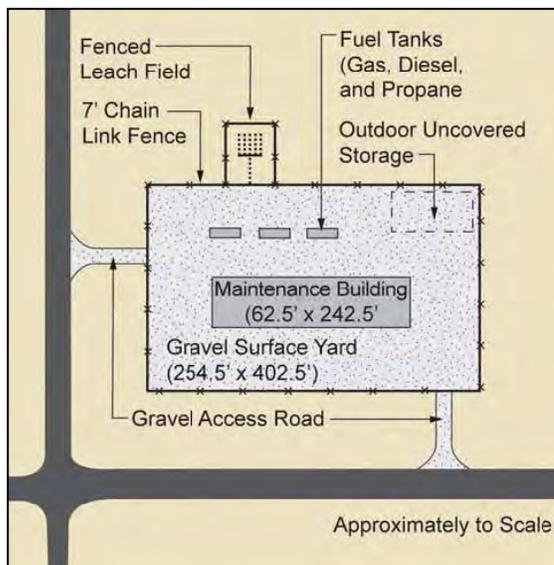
14. Operation and Maintenance Facility Conceptual Site Plan
